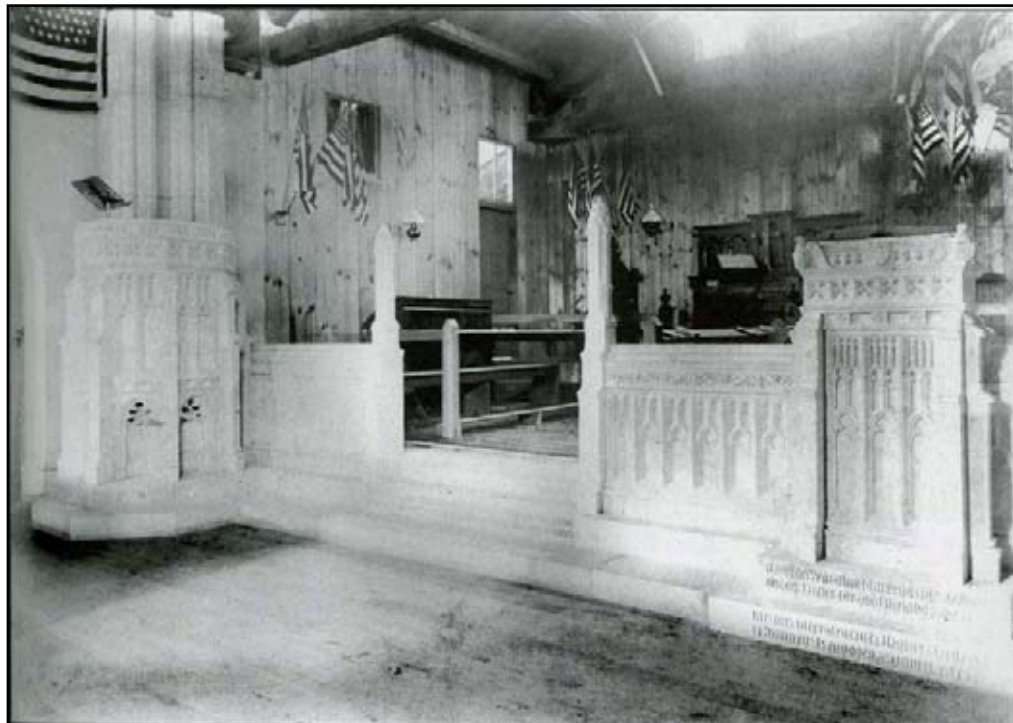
The unfinished interior of the chapel with temporary wood plank floors and walls (Swiggart, 61).
